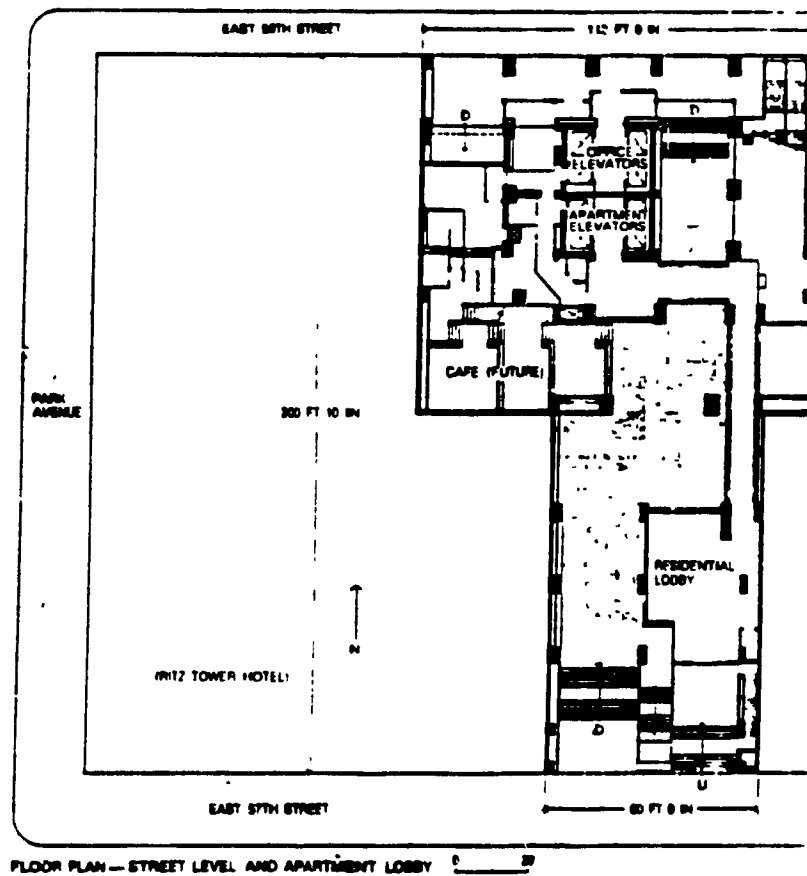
Plan of street level and apartment lobby, Galleria, New York.
